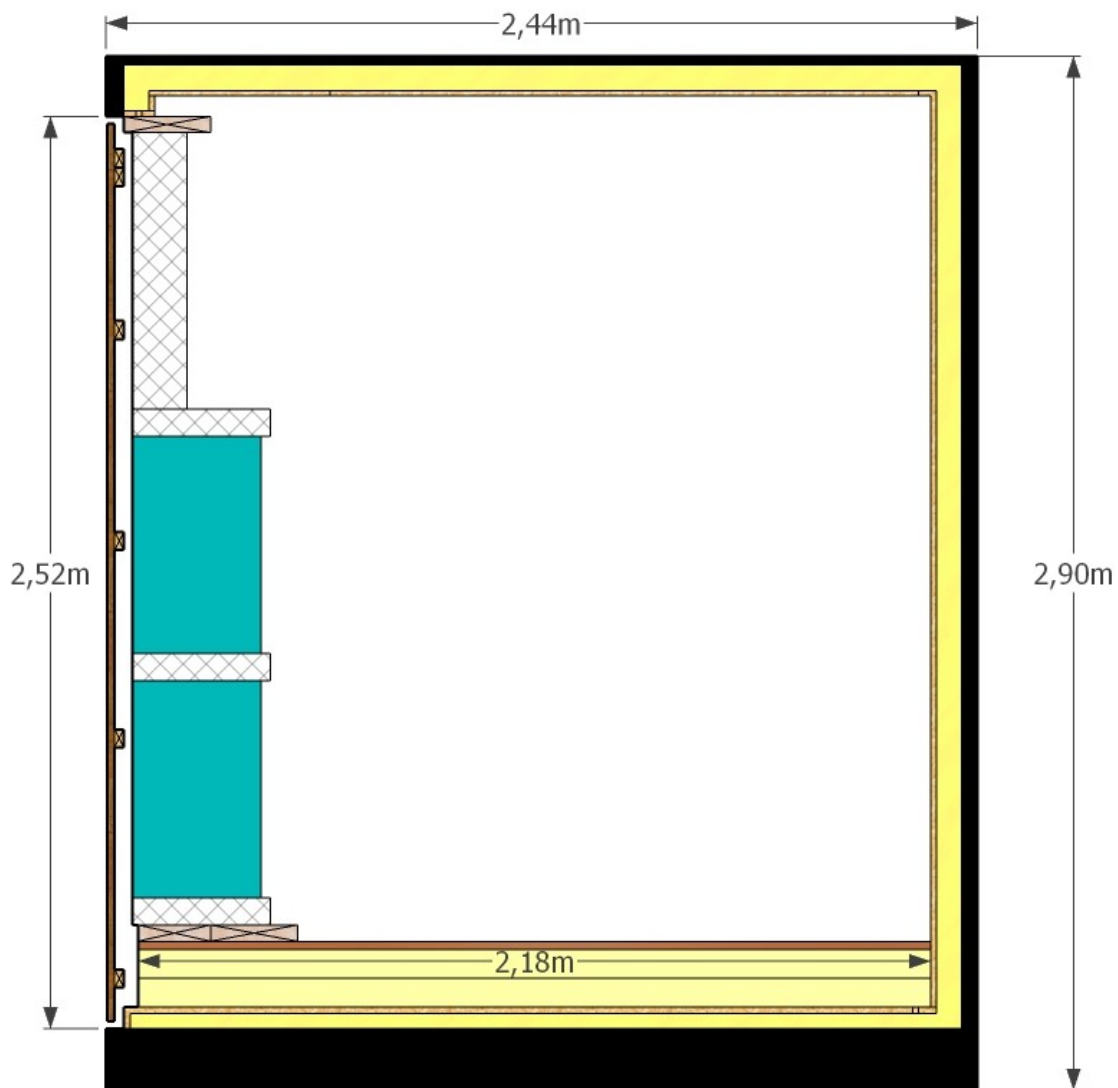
Cross section C4 showing the ventilated facade, as shown in Figure A.2.
